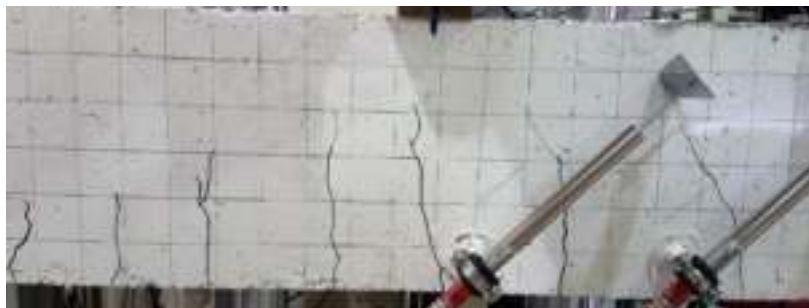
Experimental details of beam S-8-91.5-2.5-35
